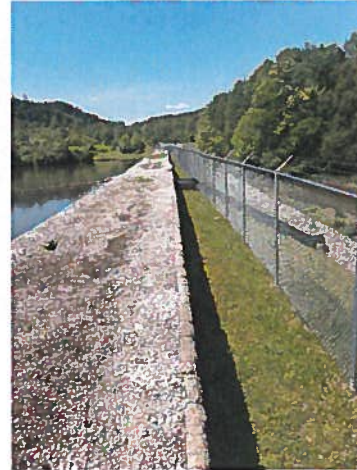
Typical view of the block wall and exterior earthen embankment. Vegetative cover is well maintained and no misalignment or erosion was observed.
